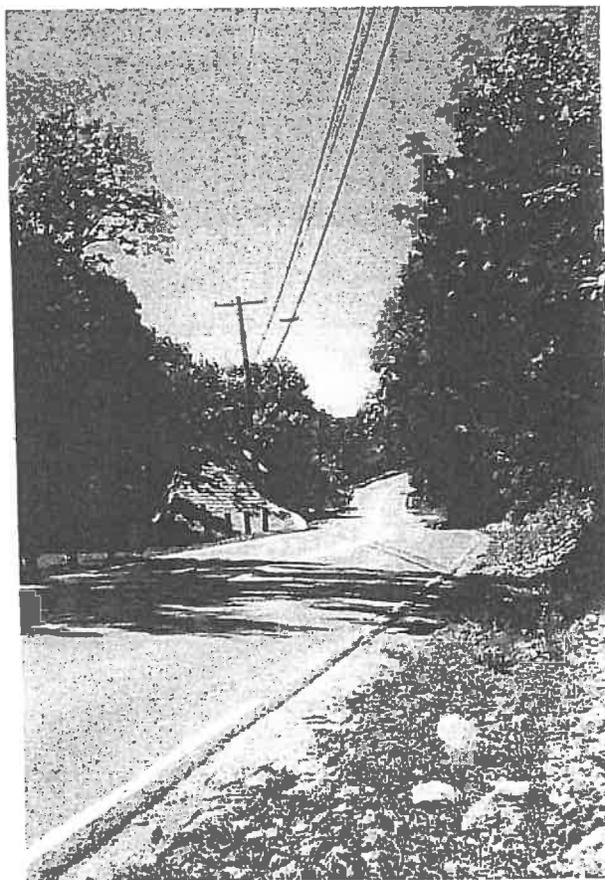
Lack of Paved Shoulder at Lord's Prayer Rock
